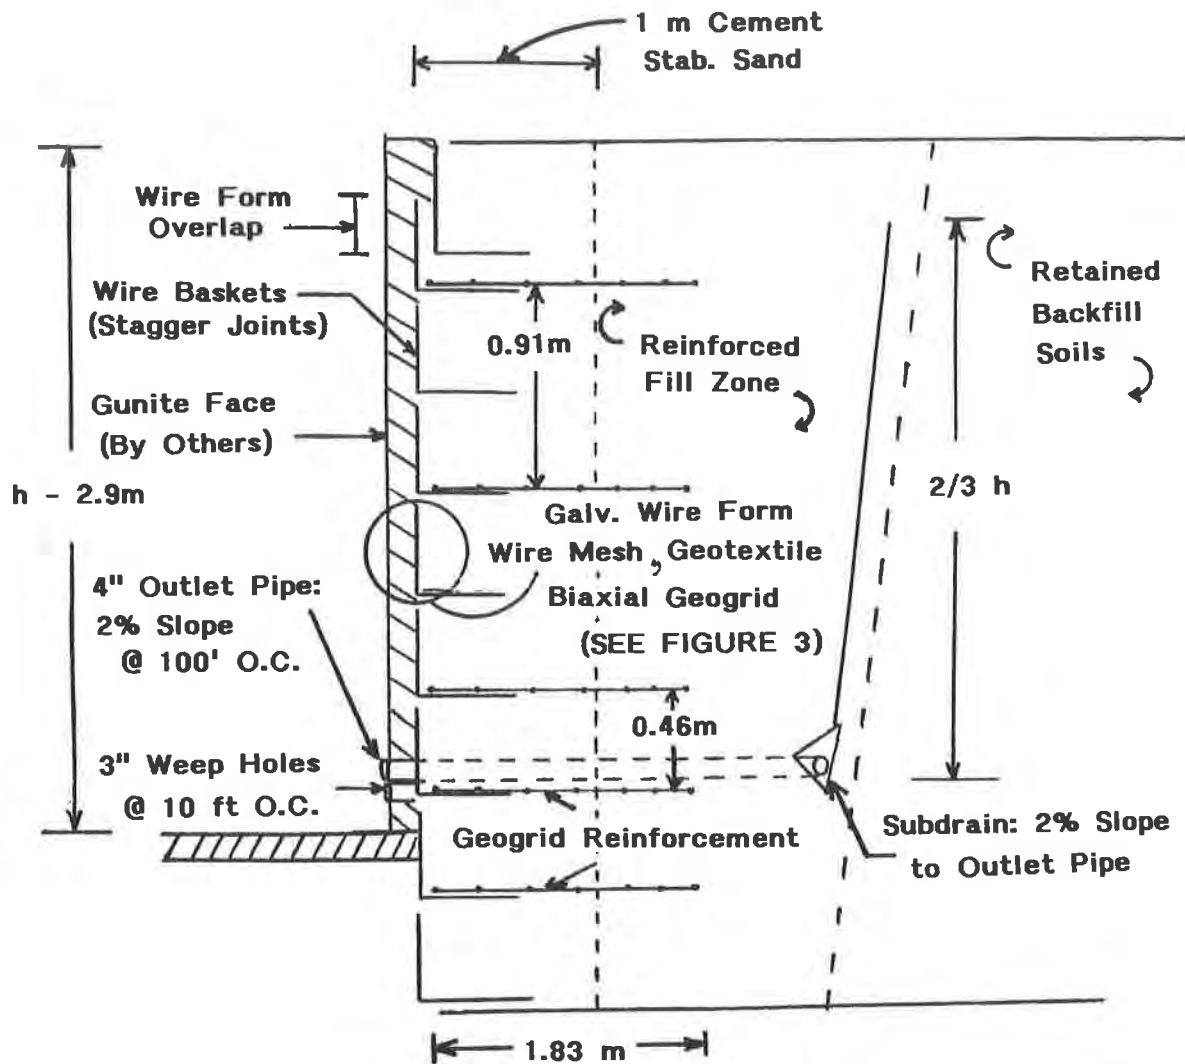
Cross-Section of Wall 3 at Blackland Gully
